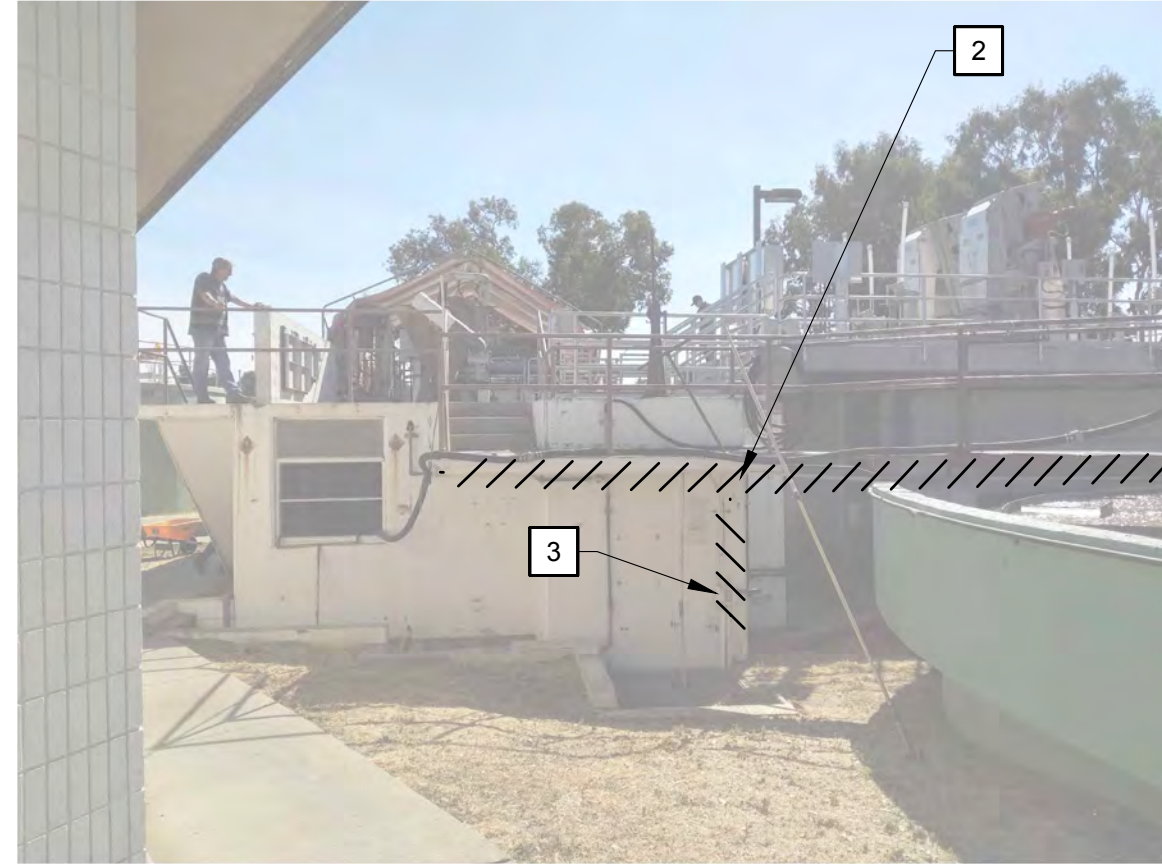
PHOTO - HEADWORKS STRUCTURE DEMO (1)
